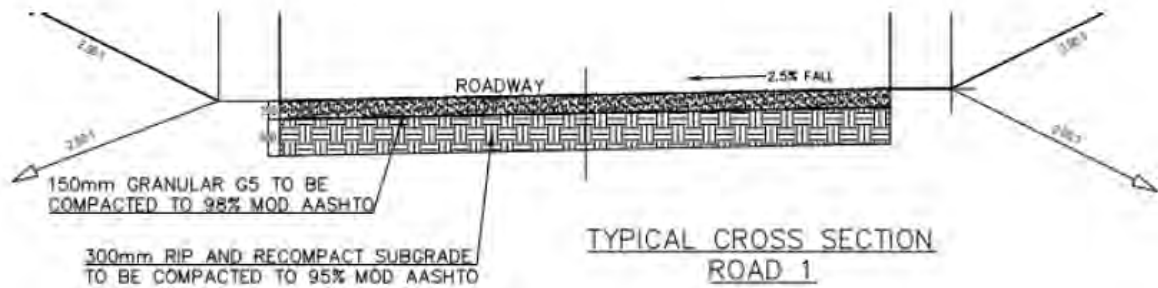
Proposed typical road cross-section (LochRoux, 2021)
